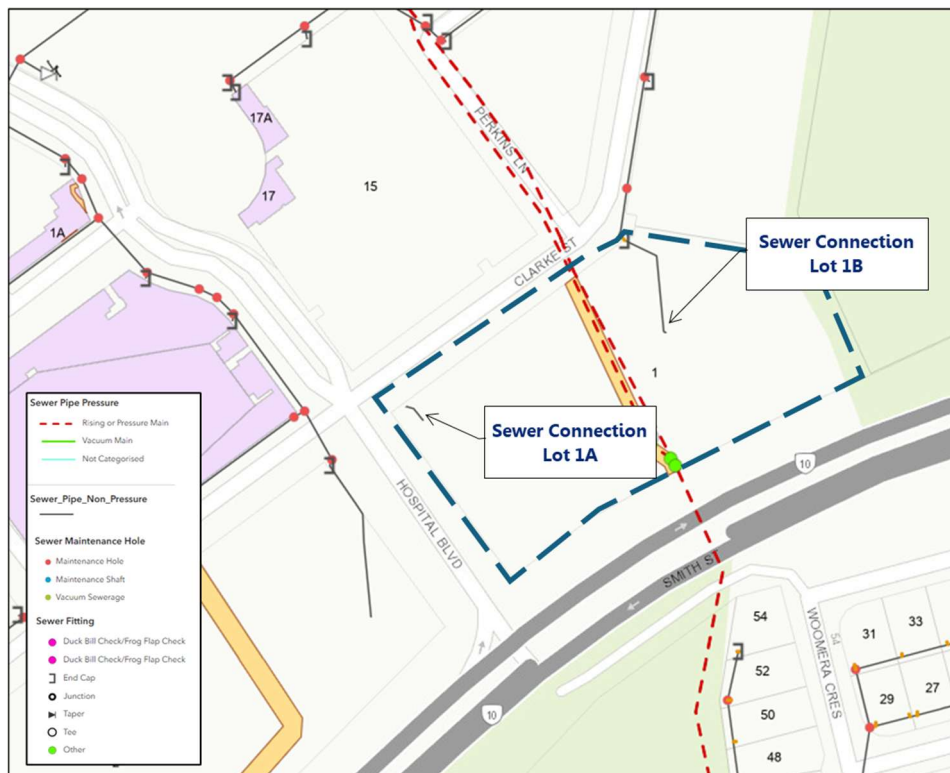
Existing Sewer Infrastructure & Proposed Connection Location
